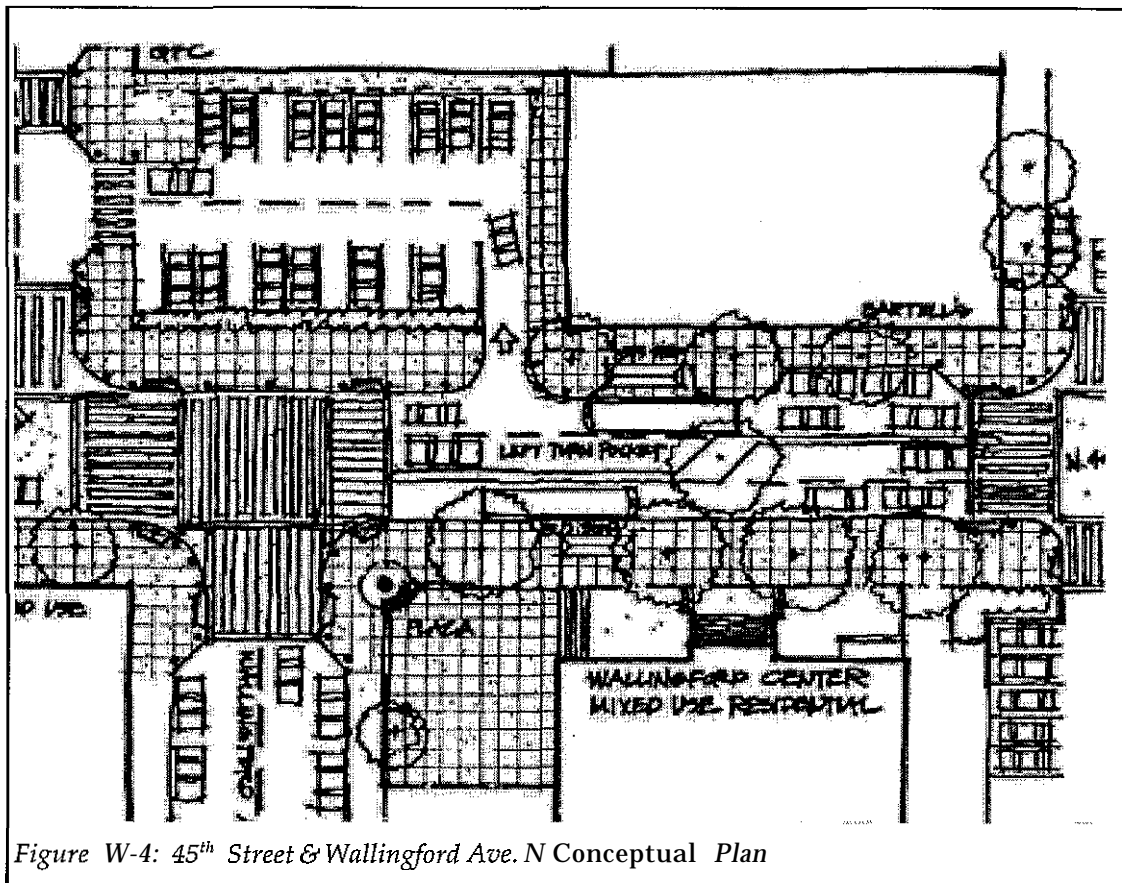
45th Street & Wallingford Ave. N Conceptual Plan
